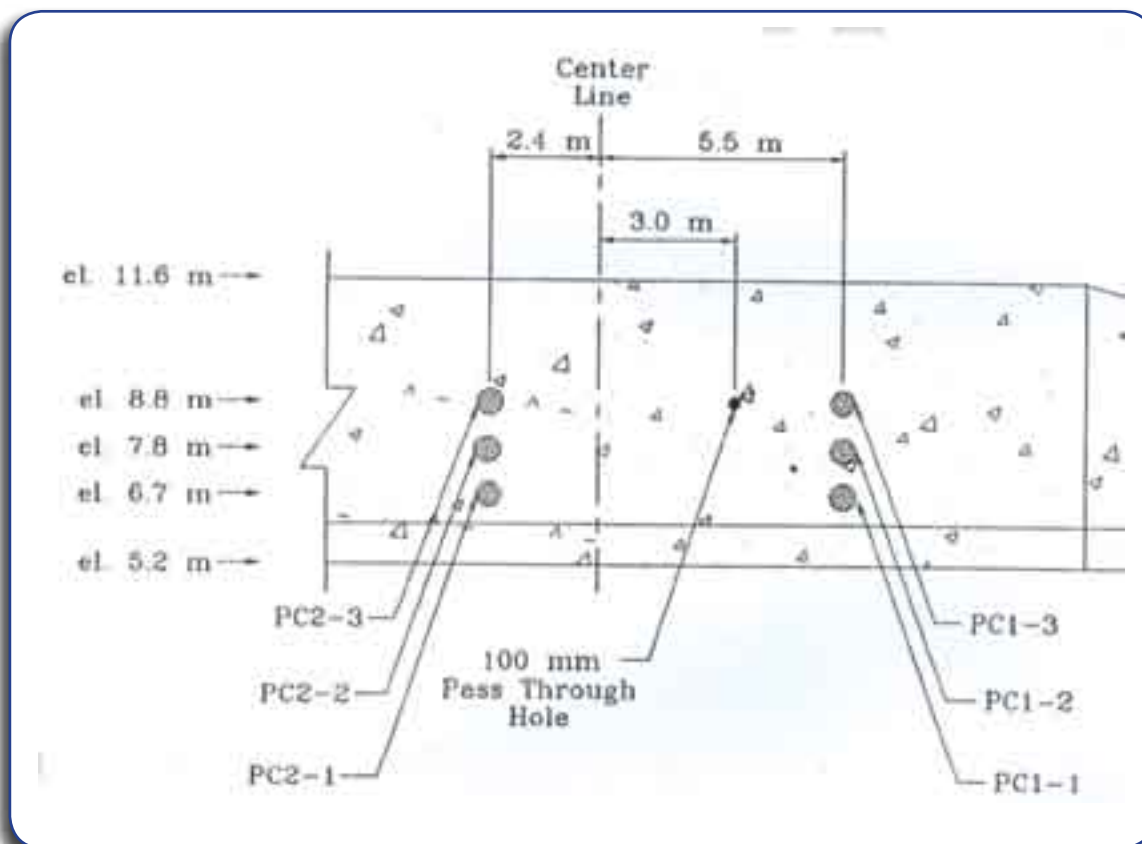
Location of pressure cells in North Abutment (Ref. 3)
